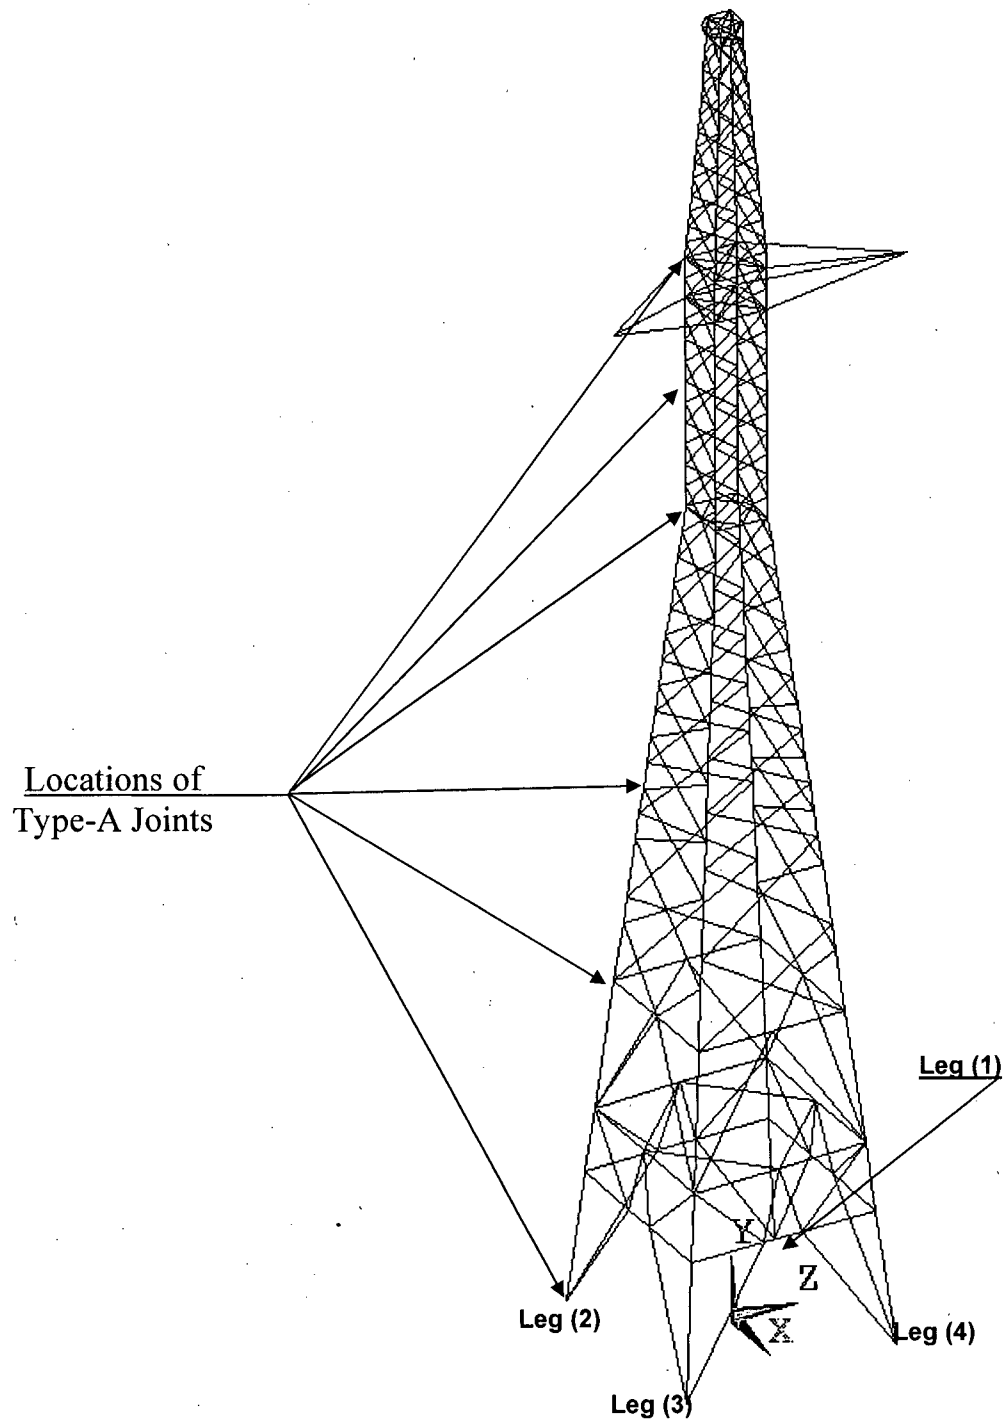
Finite element model of full-scale tower with the six locations of the type-A joints.
